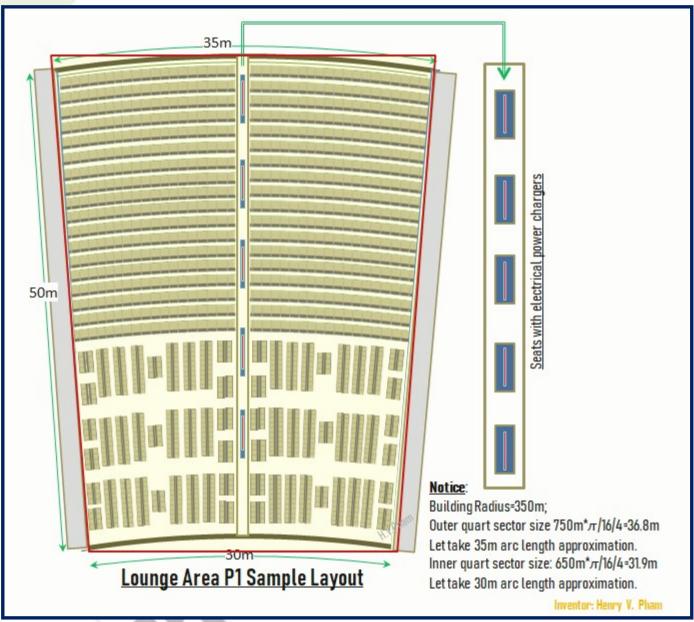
OH SMART AIRPORT -Building Level 1 Detail Departure Lounge Area Seats Sample Layout
